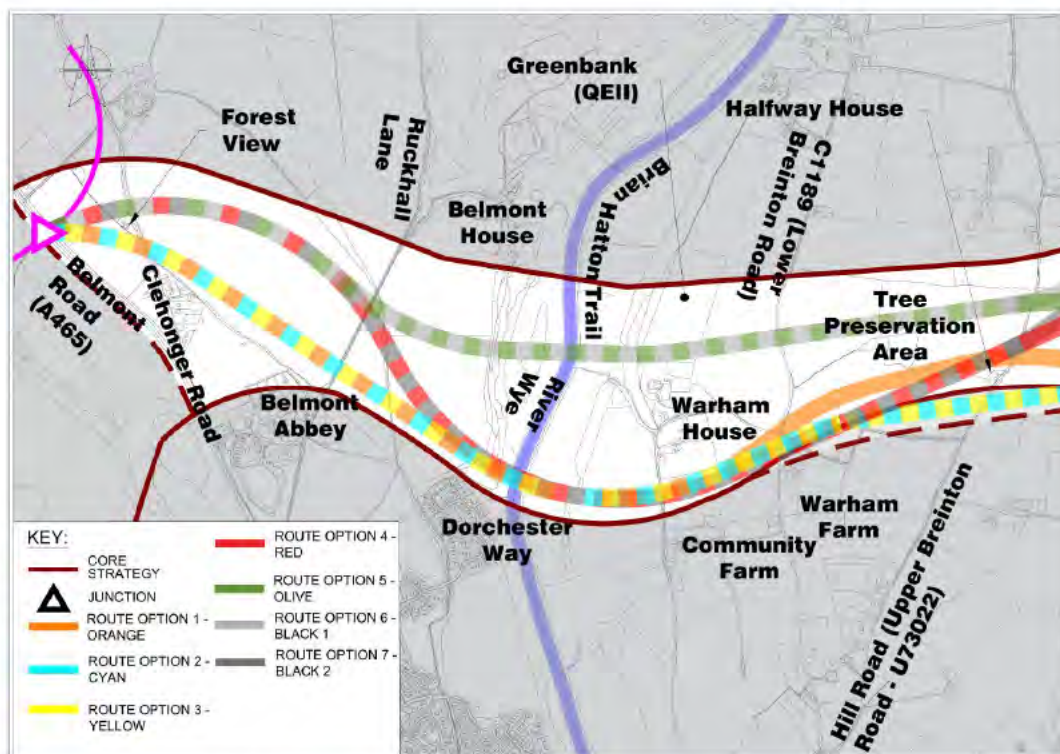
Element 1: A465 to Hill Road (Upper Breinton Road – U73022)
